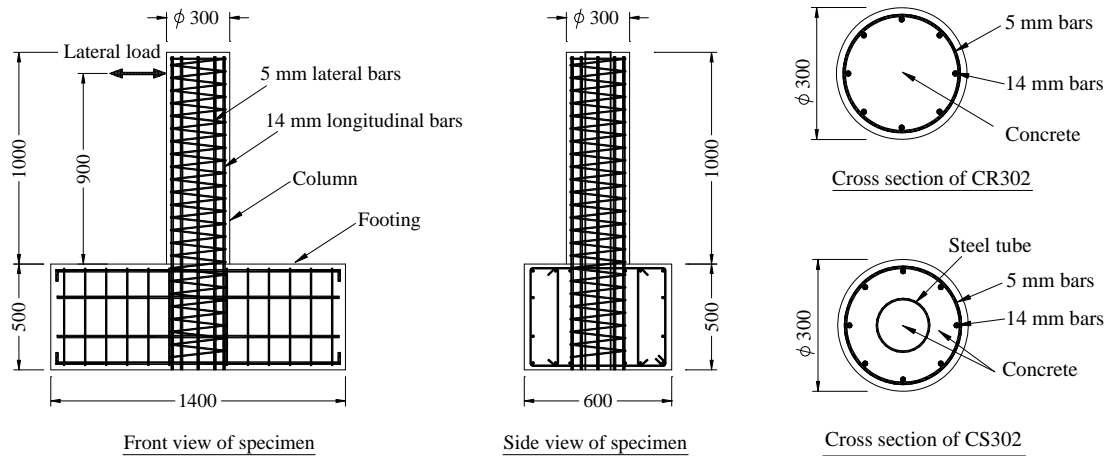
Reinforcing details of specimens (dimensions in mm)
